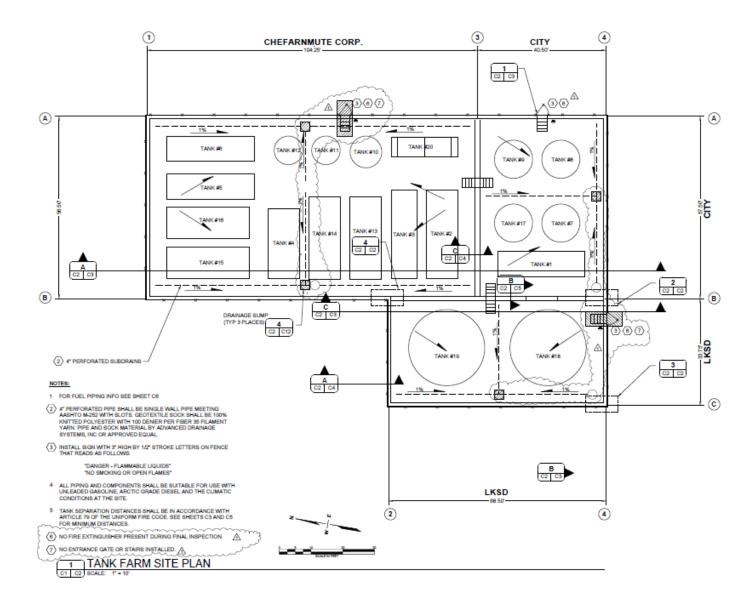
Chefornak Bulk Fuel Facility Site Plan
